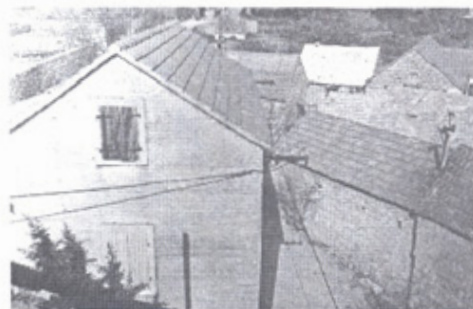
Stone and brick tile roofs in the neighborhood of house
